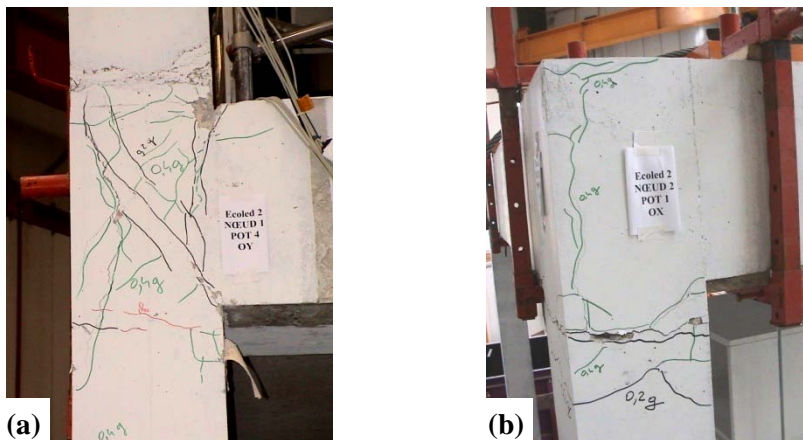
Damage after the test on bare frame at a PGA level of 0.4g in beam-column joints of (a) 1<sup>st</sup> storey, and (b) 2<sup>nd</sup> storey
